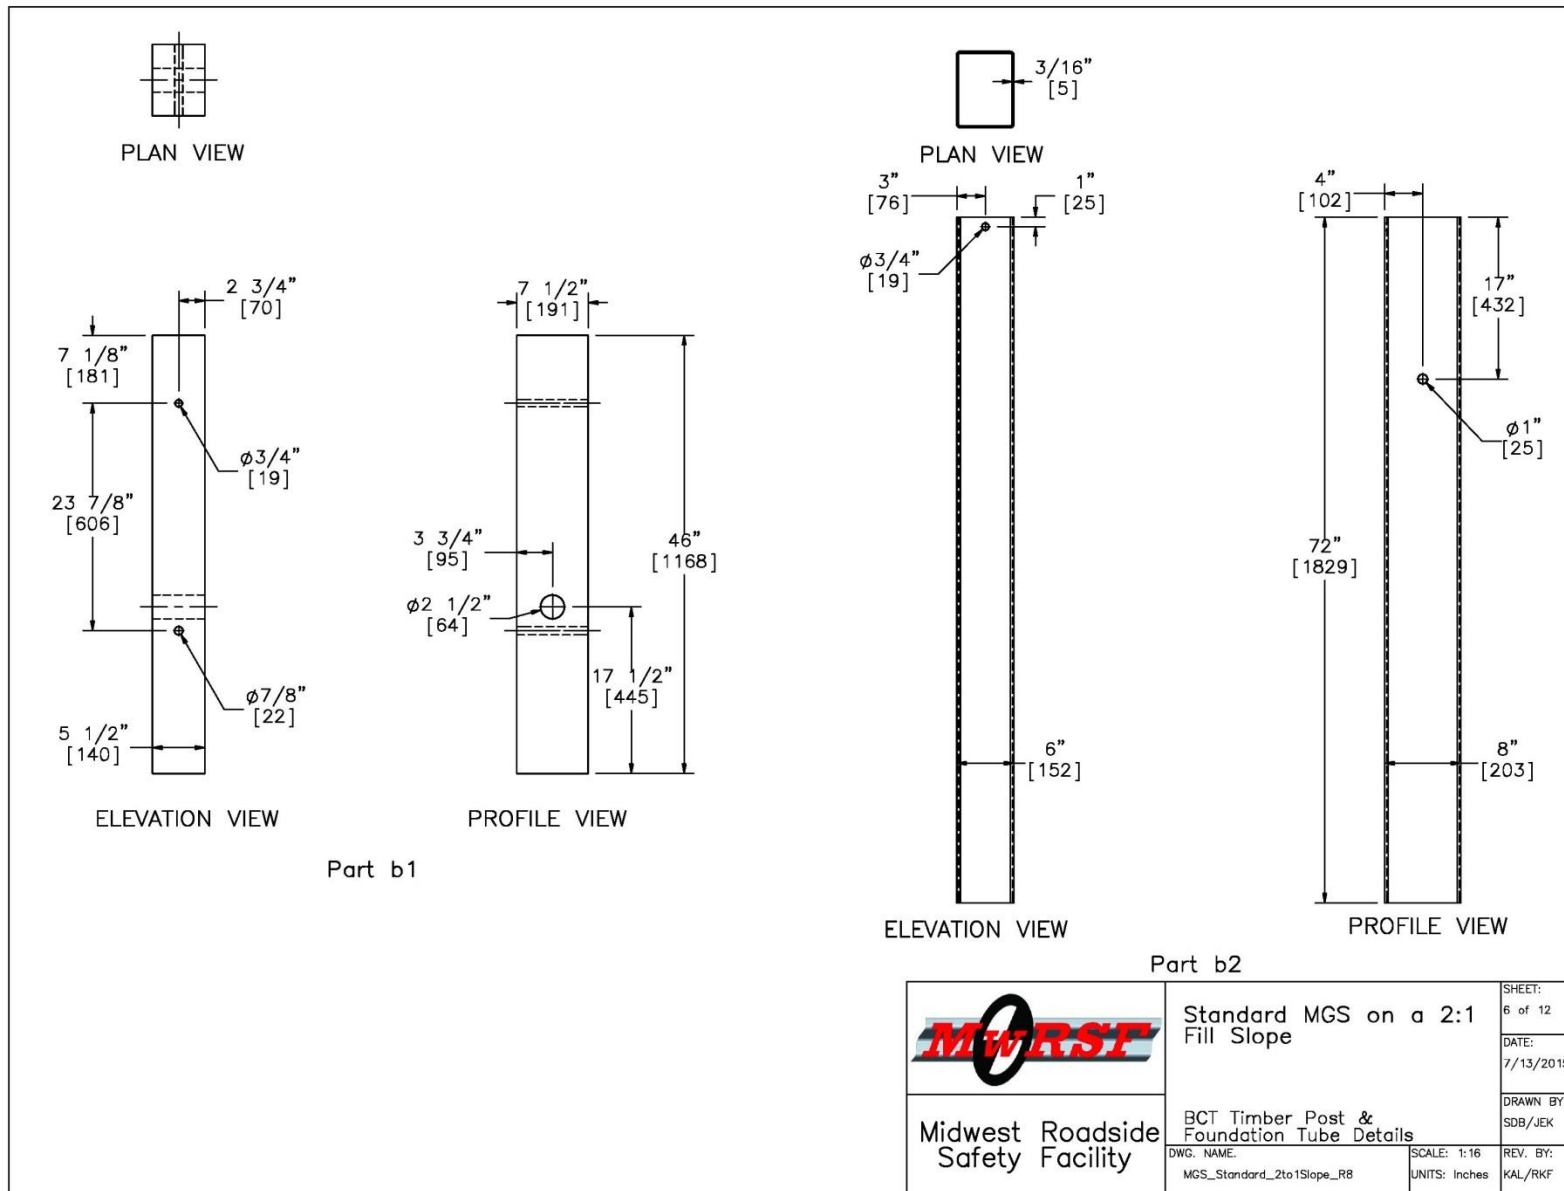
BCT Timber Post and Foundation Tube Details, Test No. MGSS-1
